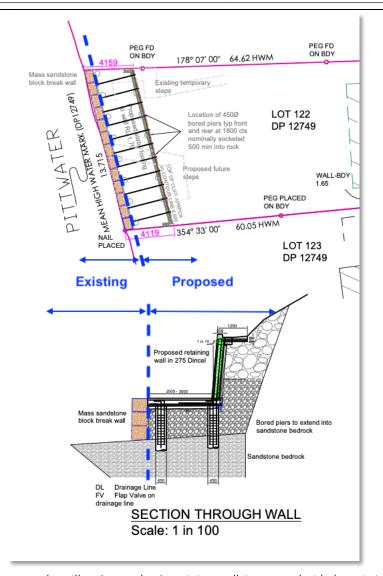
Detail of proposed ancillary (secondary) retaining wall, integrated with the existing sandstone sea retaining wall
